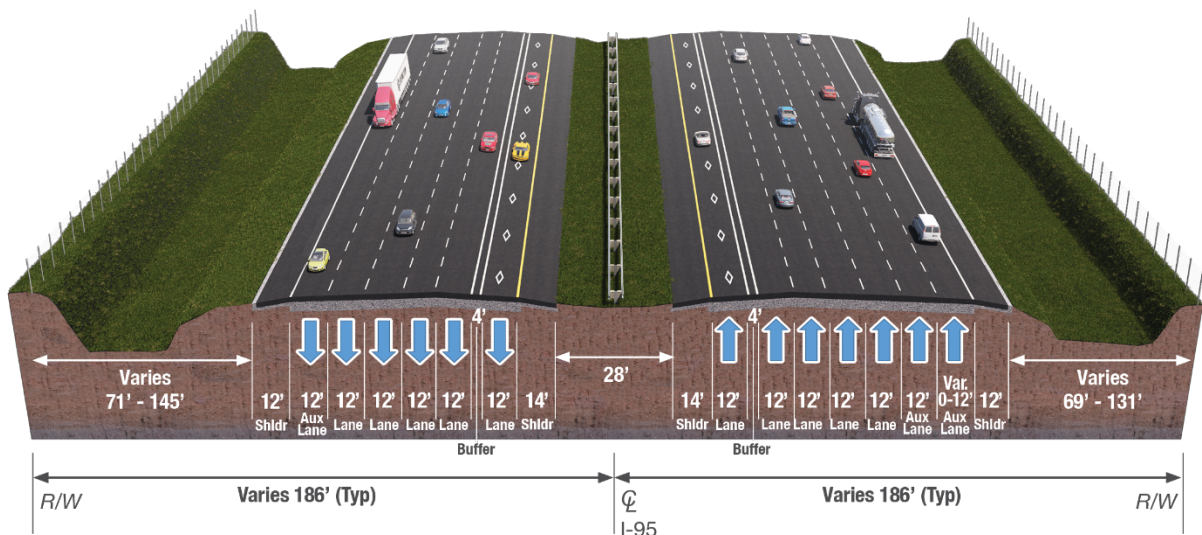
Typical Section – I-95 North of Central Boulevard (Mainline Alternatives 2 and 3)
